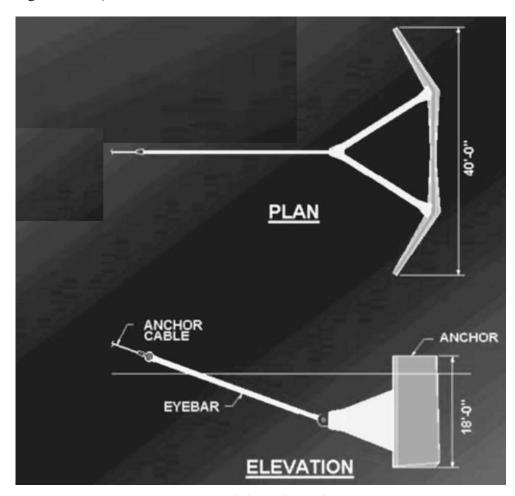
Precast Concrete Fluke Style Anchor
